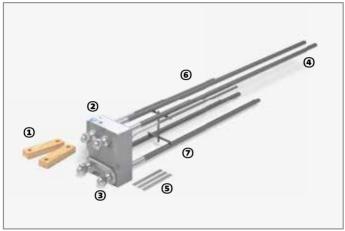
Schöck Isokorb® type KS20 with timber transport blocks and levelling shims
